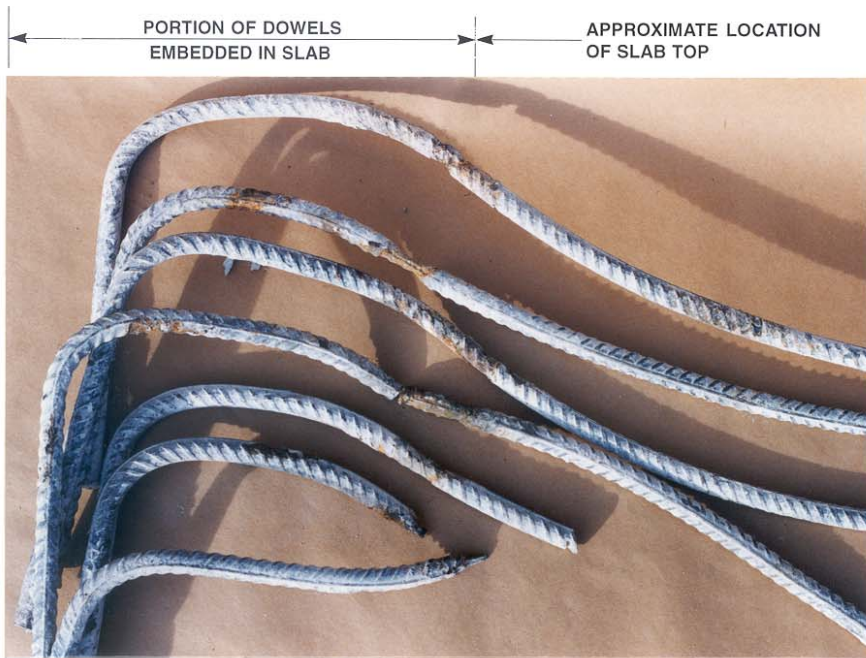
Corroded #5 dowels removed from concrete slab along east and south walls.
